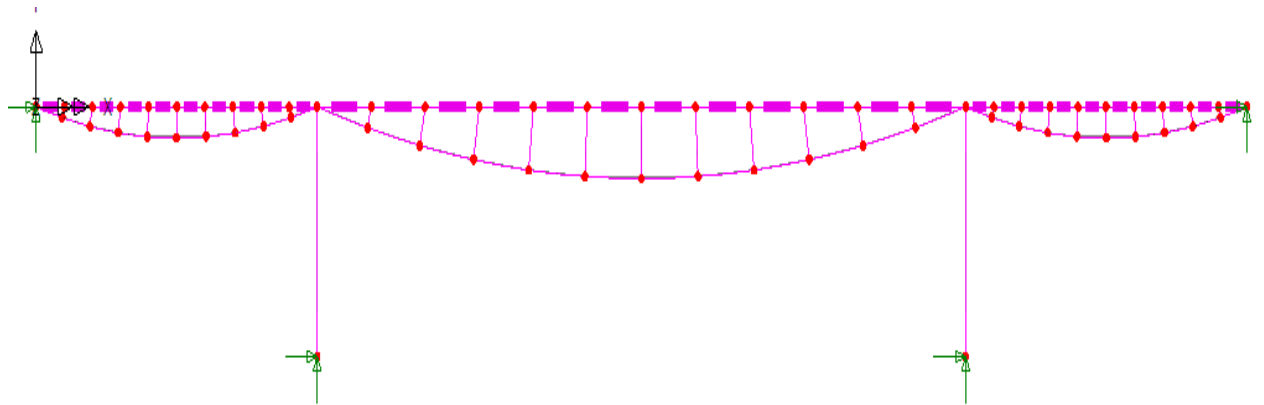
Multiple Spans Under-Deck Cable Stayed Bridge
